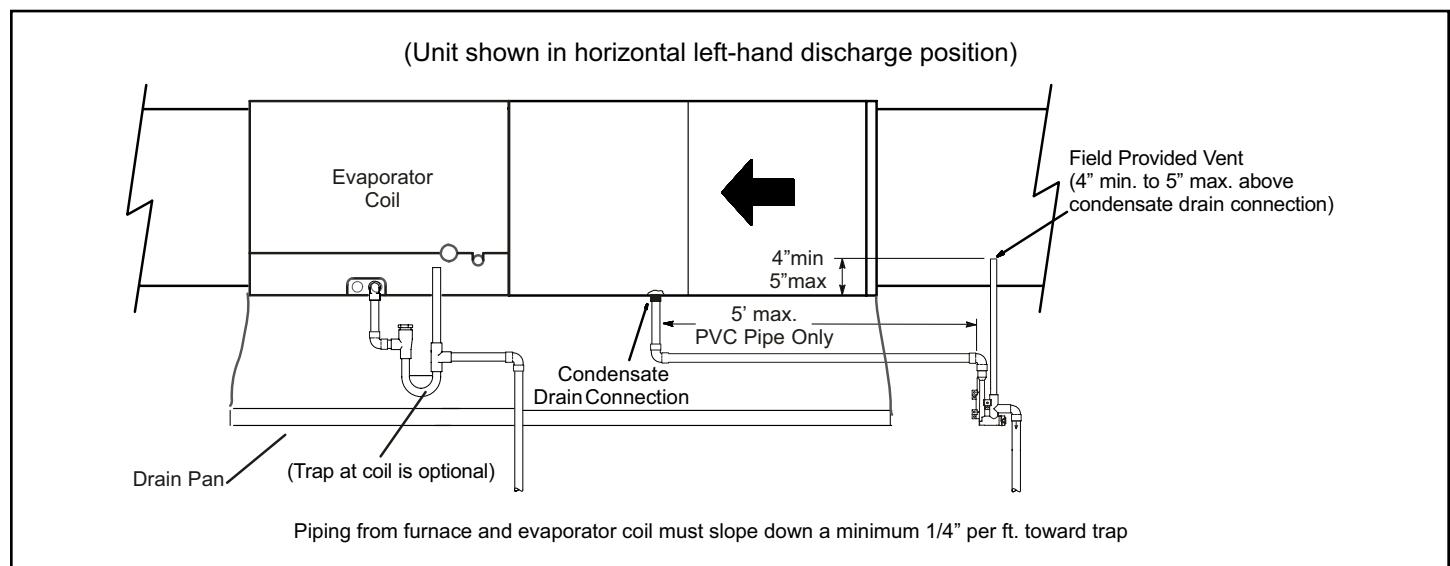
Furnace with Evaporator Coil Using a Separate Drain
